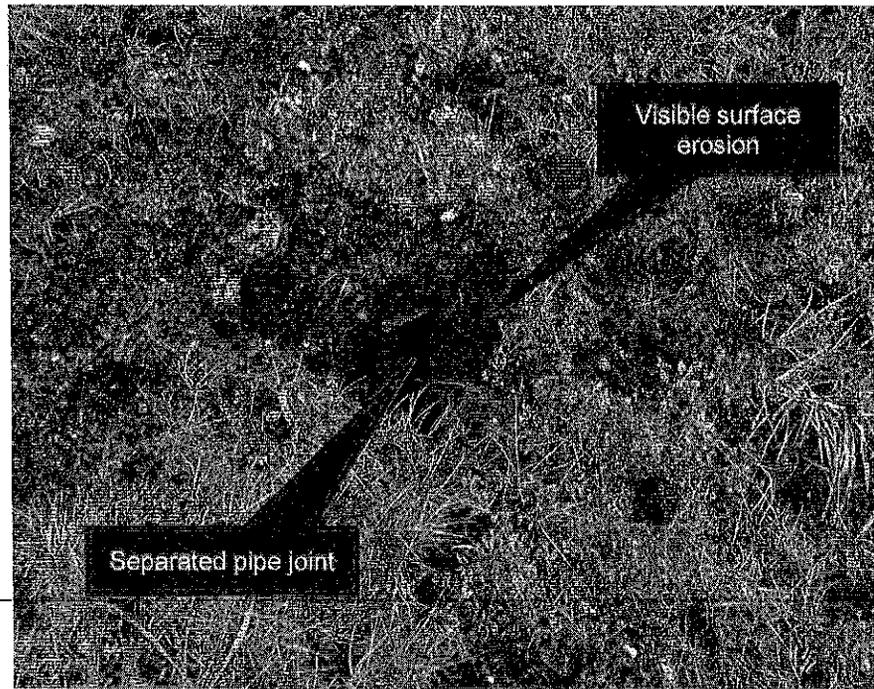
Separated joint in road shoulder with surface erosion visible.
